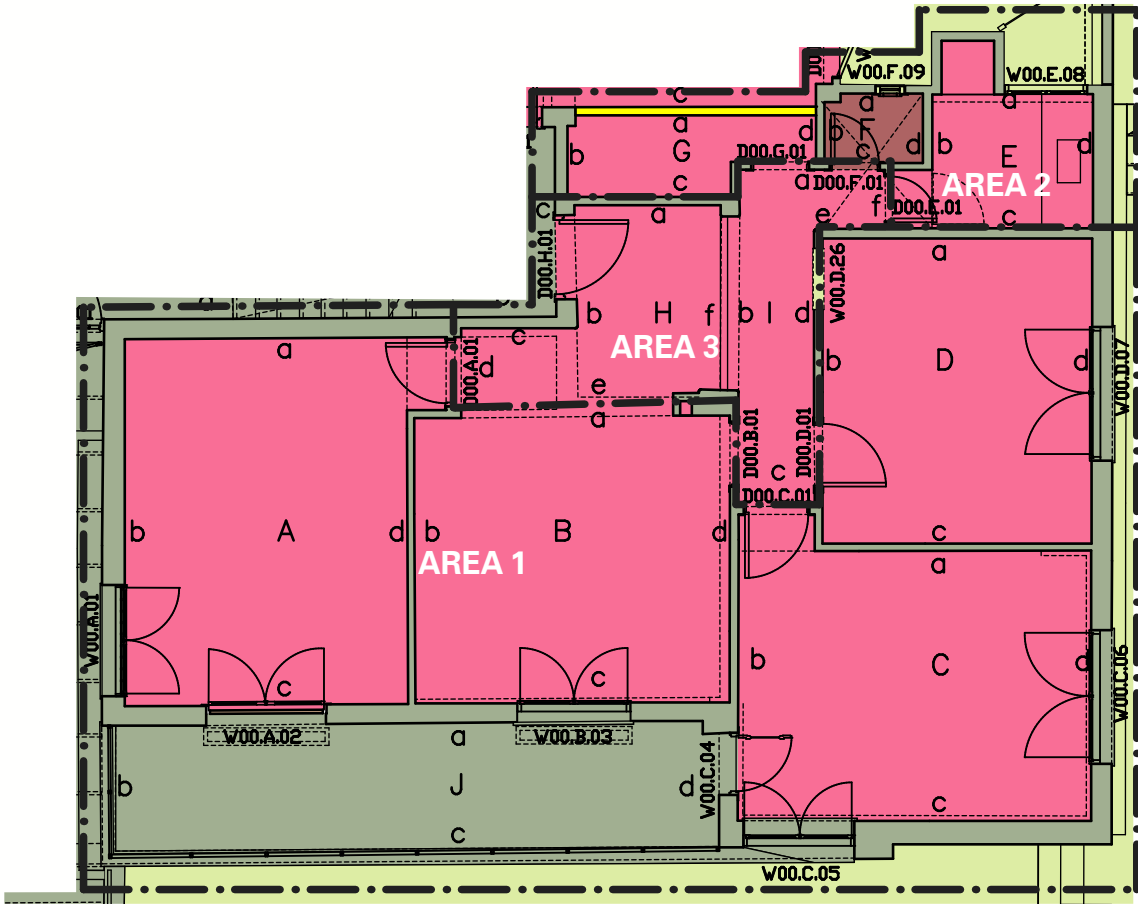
1st floor, apartment 1, preservation measures, walls and floors
